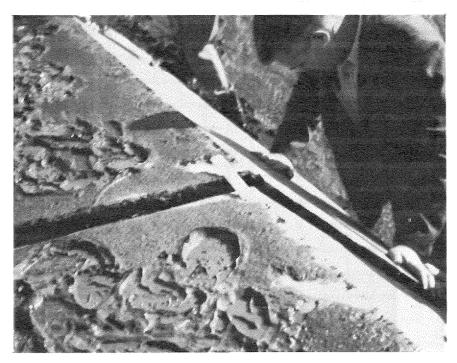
Opening of second joint from gate tower in circulator connection conduit,
